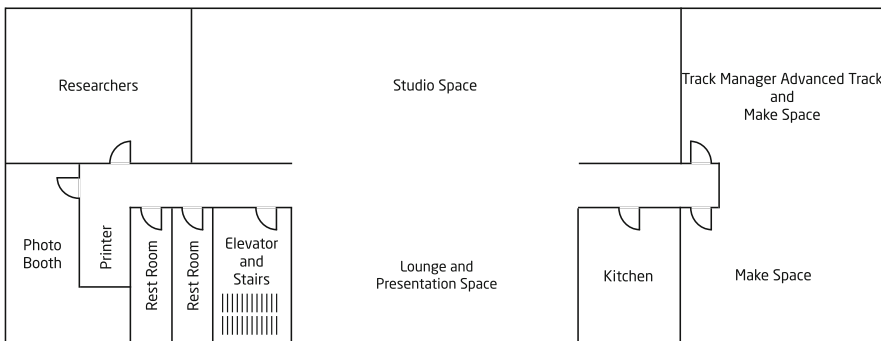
Floor plan, 2nd floor, HPI D-School Potsdam (schematic)
